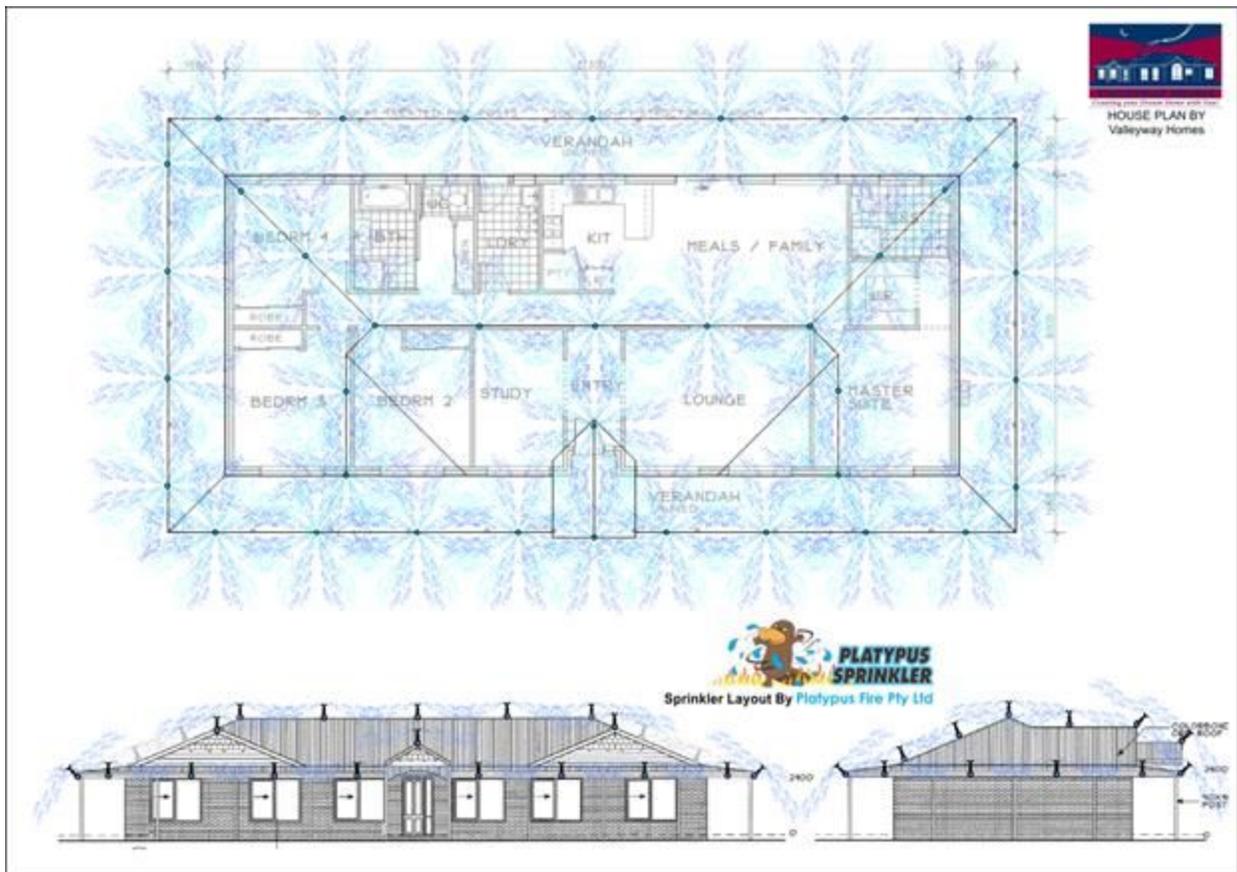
Example Platypus installation diagram showing the areas of coverage, sprinkler locations, piping arrangements, and layout for a roof size of 12 x 24.6 meters [n].
